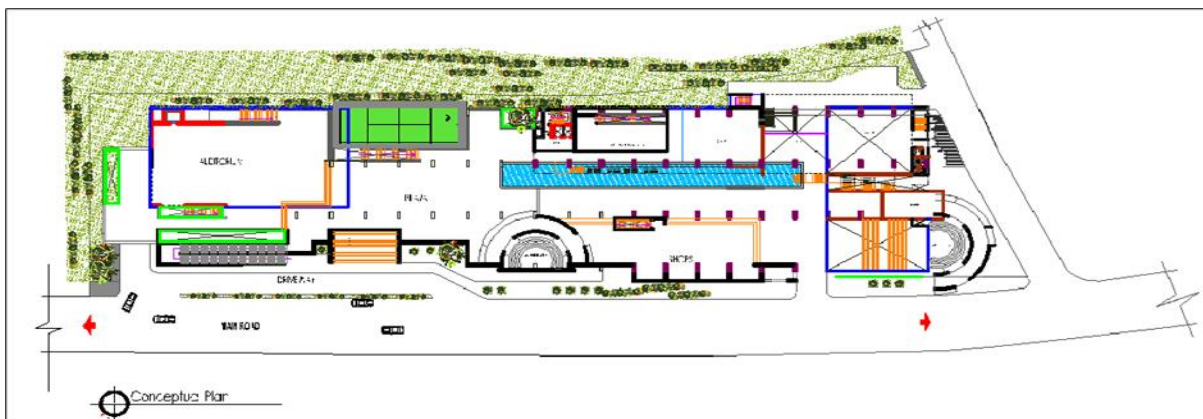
Proposed Layout Plan of Games zone at Char Montaz
